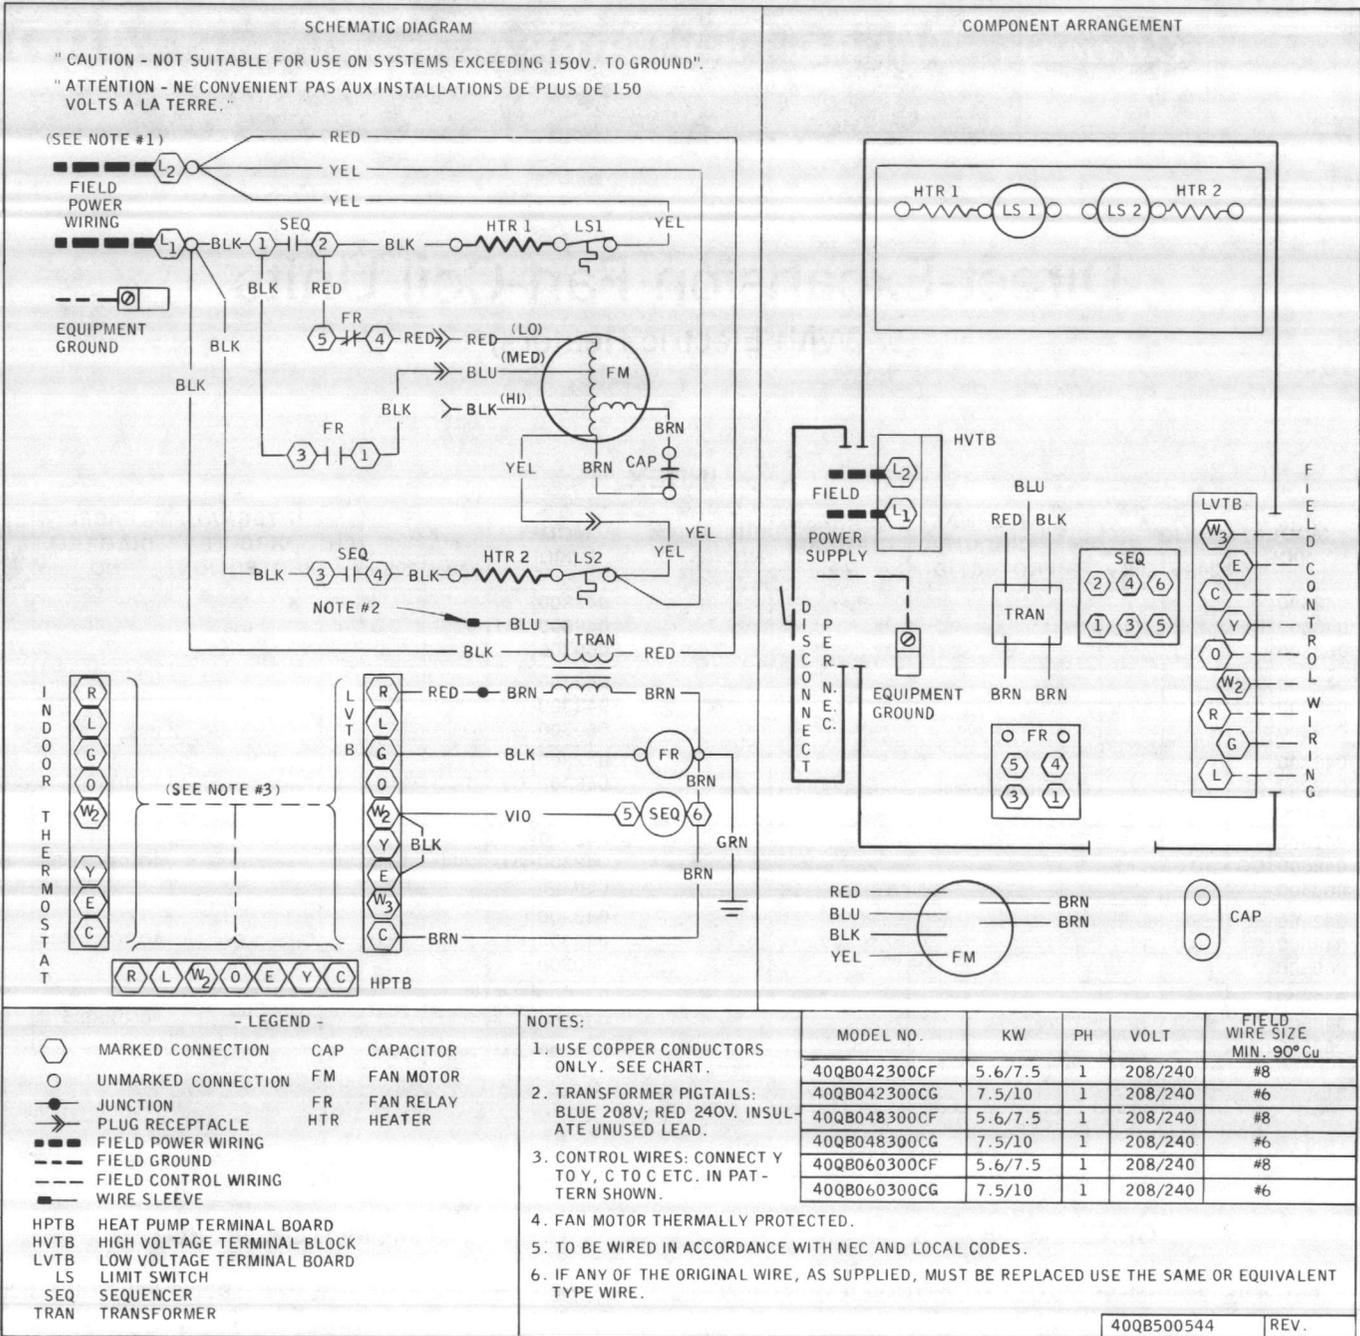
Label Diagram – 40QB042300, 048300, 060300CF,CG; 240/208/1/60
